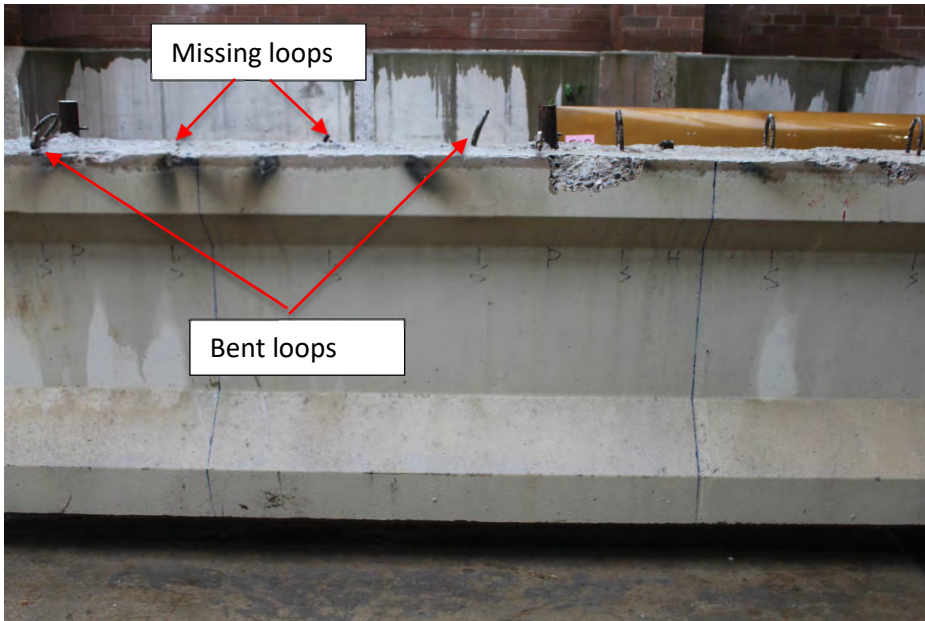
Damage to protruding part of transverse reinforcement Girder P2
